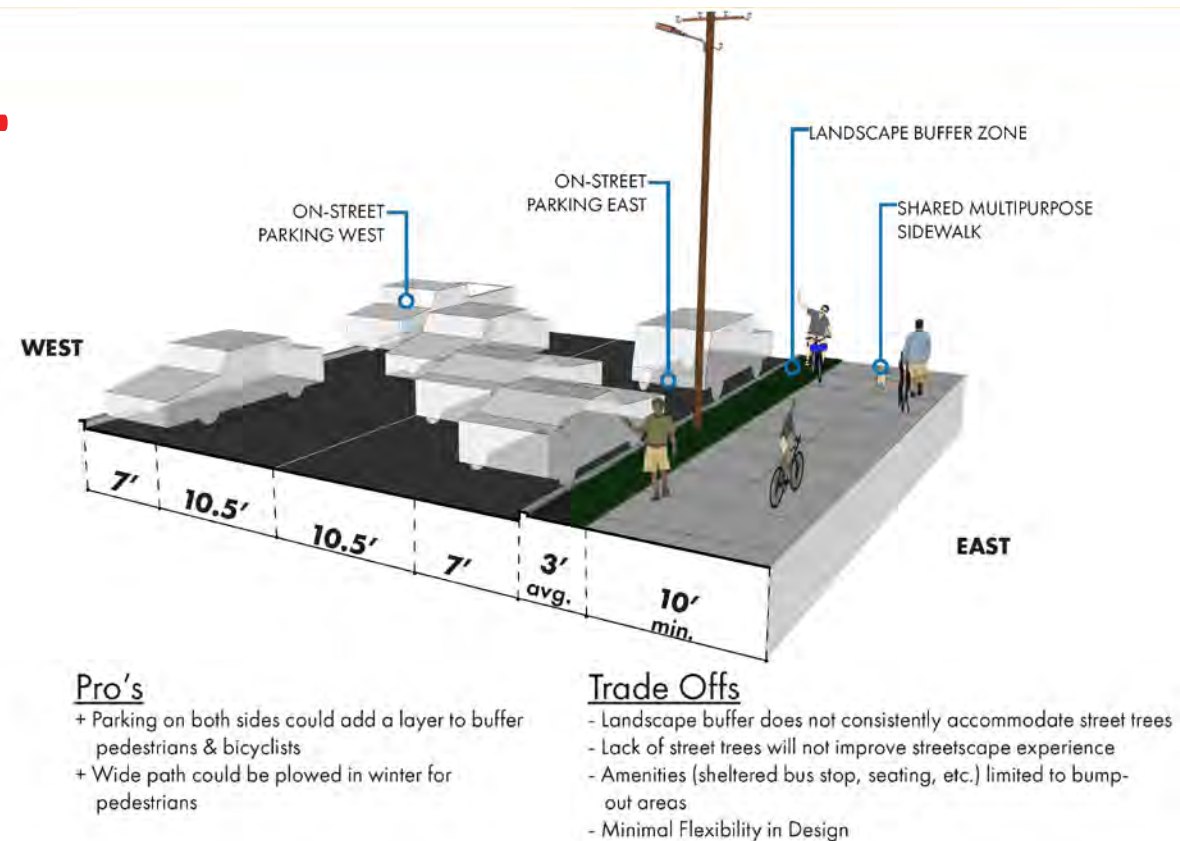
Craig Street Option 4: On Street Parking East and West with Multi-Use Trail East
